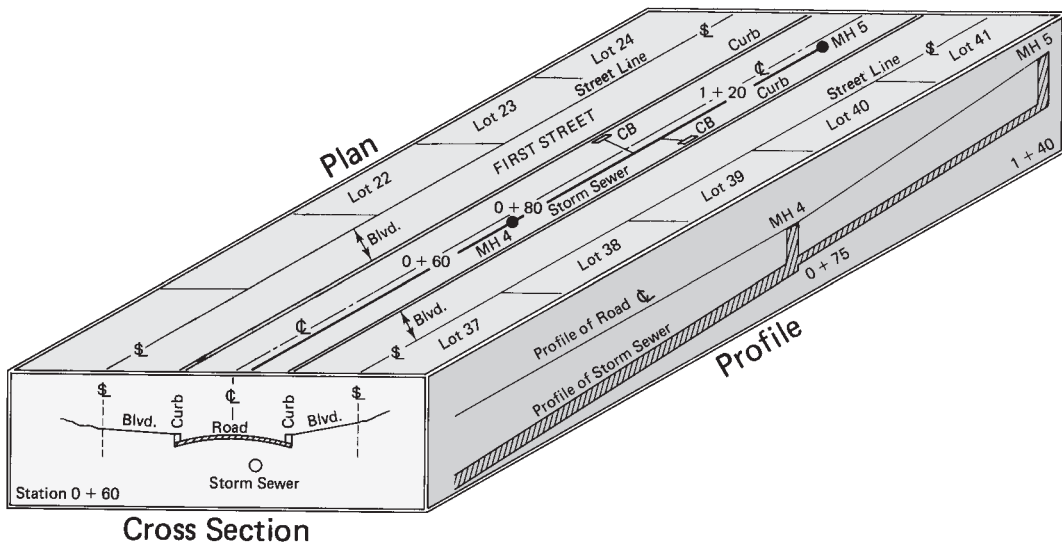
Relationship of plan, profile, and cross-section views.
